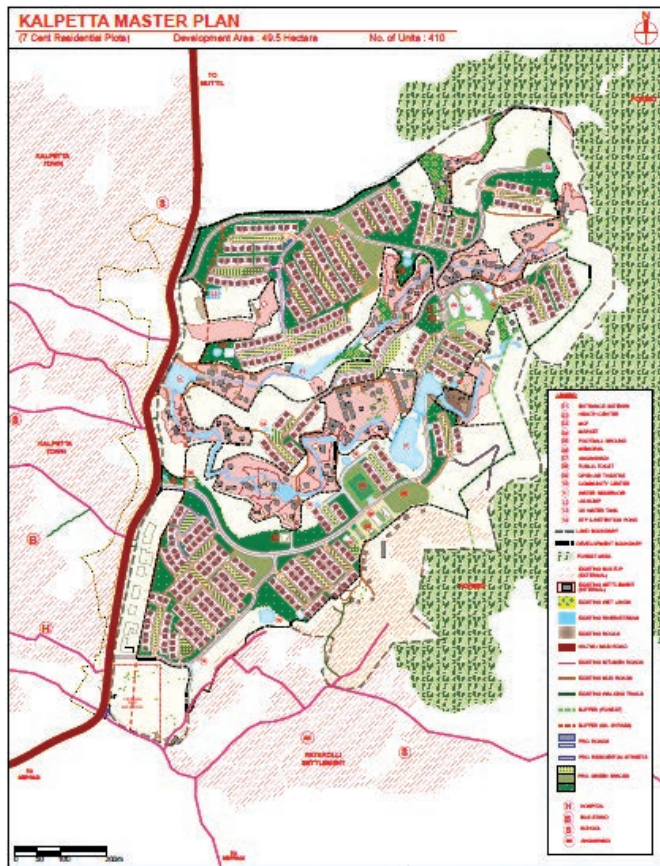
Township Master Plan—Residential Clusters and Road Hierarchy.
